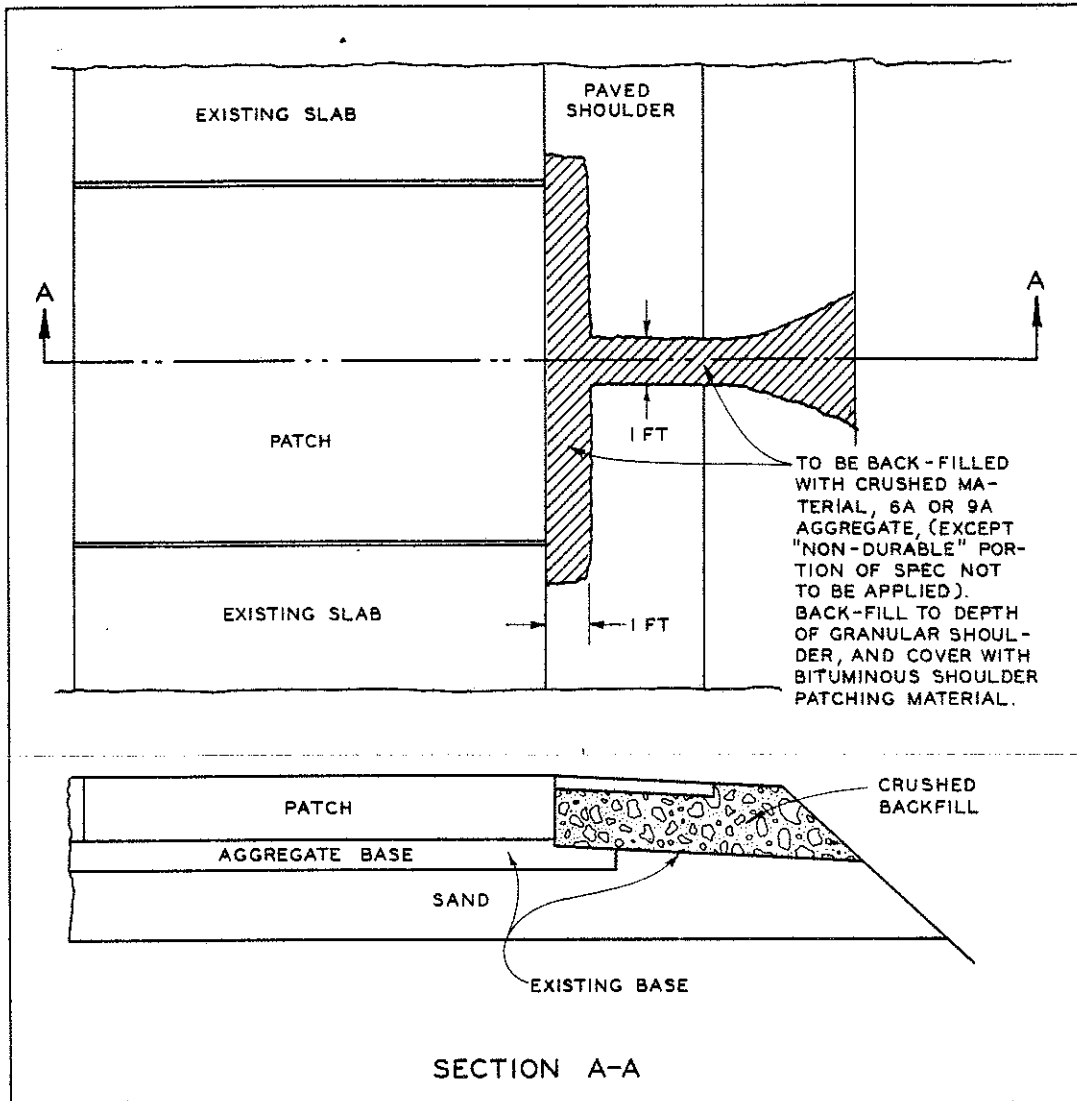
Details of shoulder drain at full-depth, cast-in-place concrete patch.
